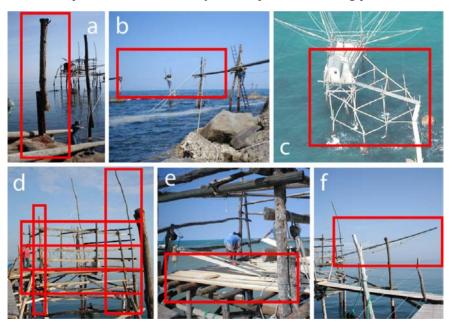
Images of the rehabilitation process: a) foundations and vertical elements of the footbridge; b) horizontal structure of the footbridge; c) stabilization structures; d) vertical and horizontal structures of the fishing plan; e) fishing plan partition elements; f) structures of the fishing device.
